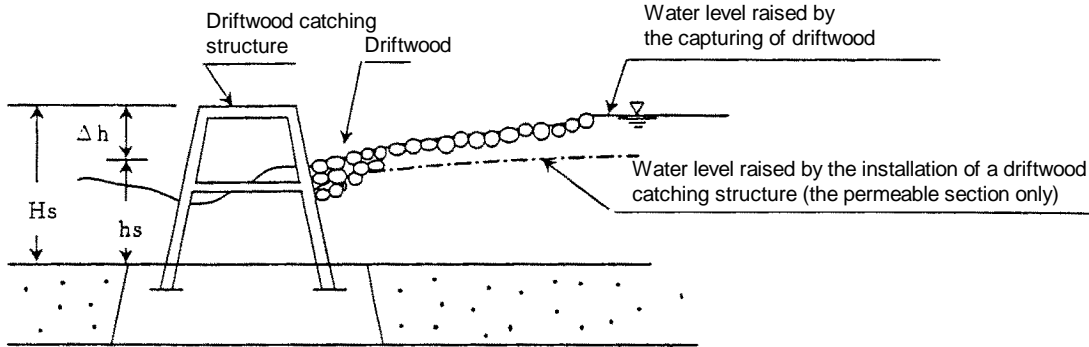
Schematic of the permeable section height (H_s) of the driftwood entrapment works installed in the bed load section
